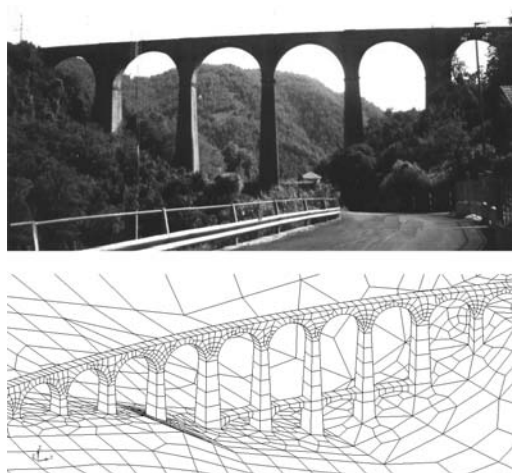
The Acquasanta (Genoa) railway bridge and its three-dimensional numerical modelling.
